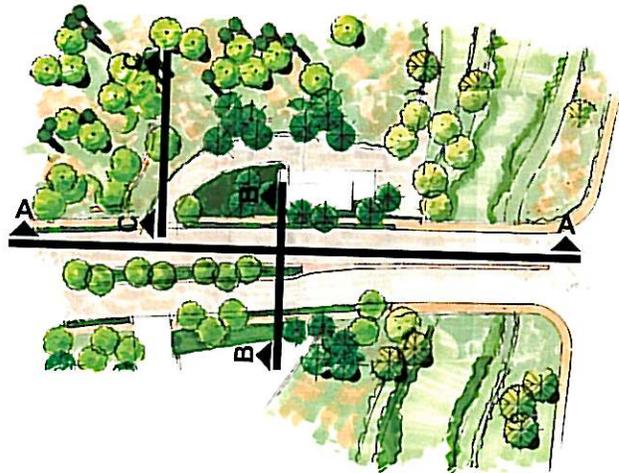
Plan view of major entry enhancement - Aliso Creek Road
